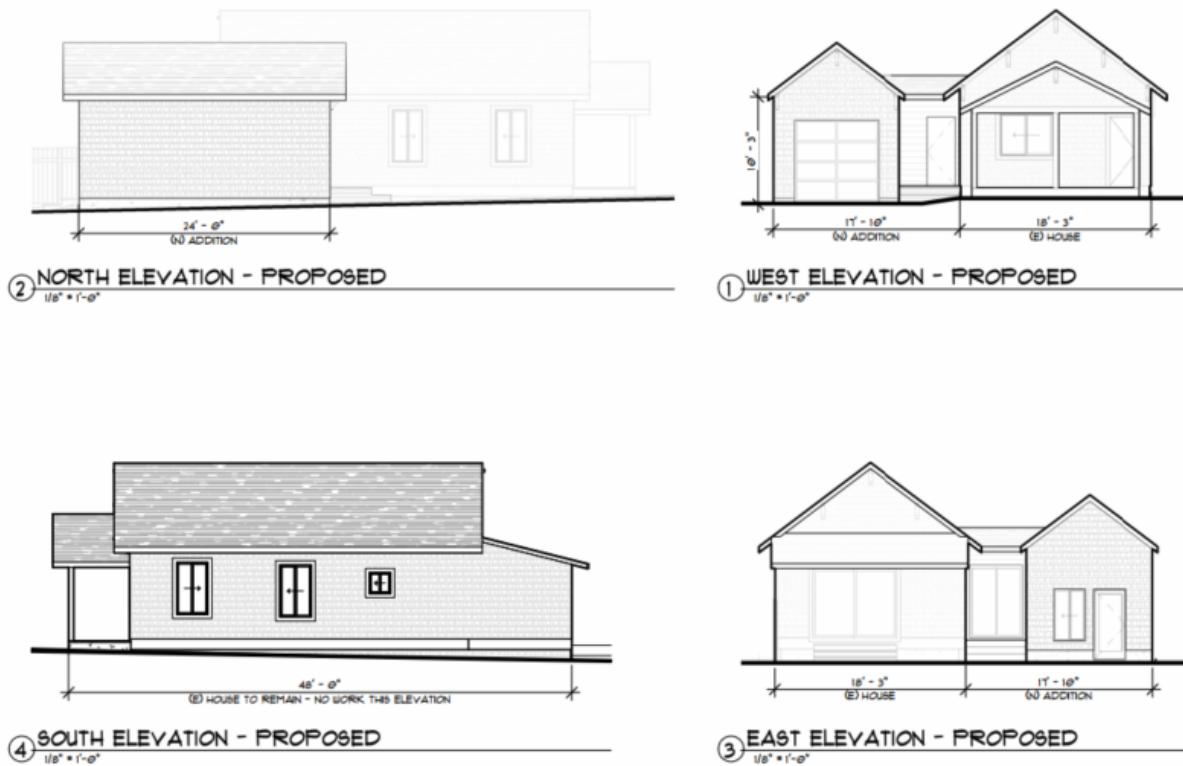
Elevations for proposed rebuild/reconfiguration of attached garage
